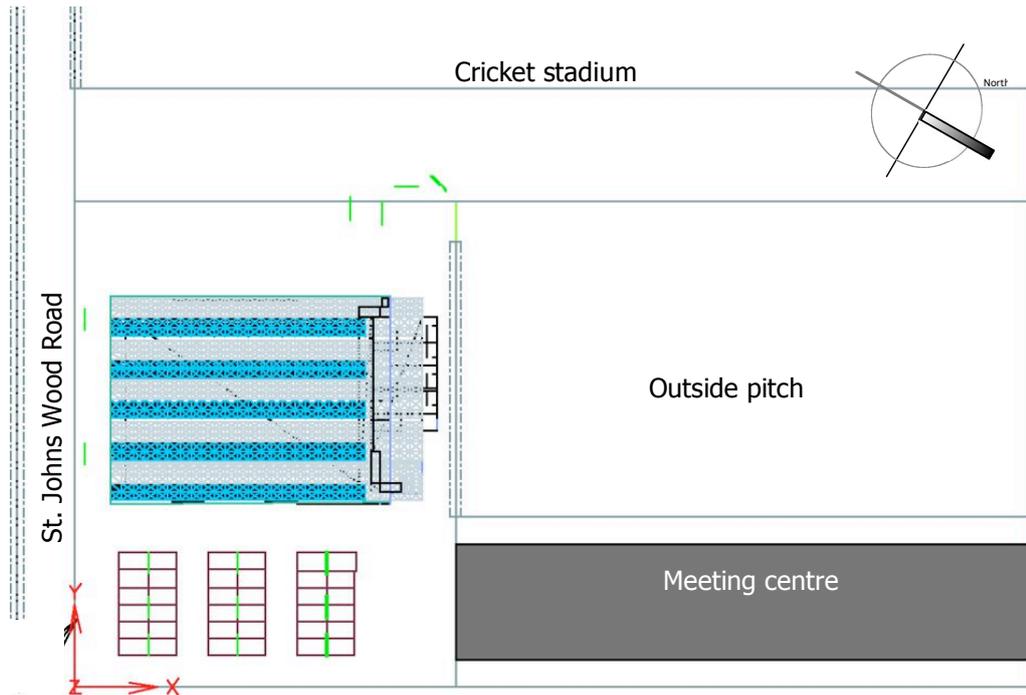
Site plan of the indoor cricket school, Lords Ground, London.
